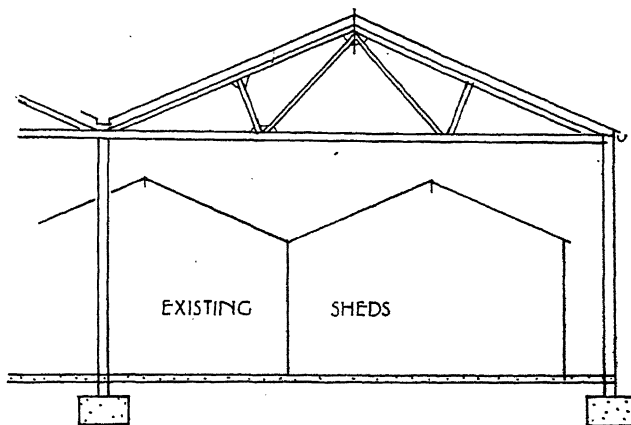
NEW FRAMED BUILDING ERECTED OVER AND WITHIN EXISTING
